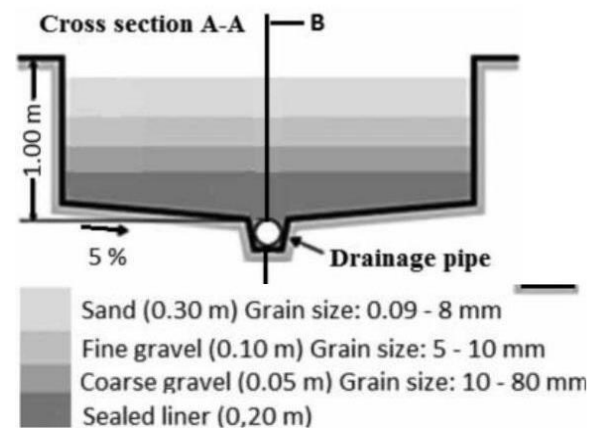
Cross sections of the drying beds. (Seck et al., 2015)
